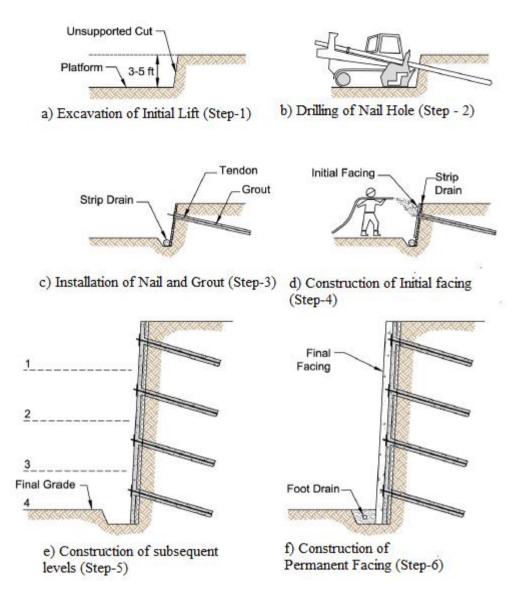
Construction Sequence of Soil Nail Wall modified (modified after FHWA, 2015)
